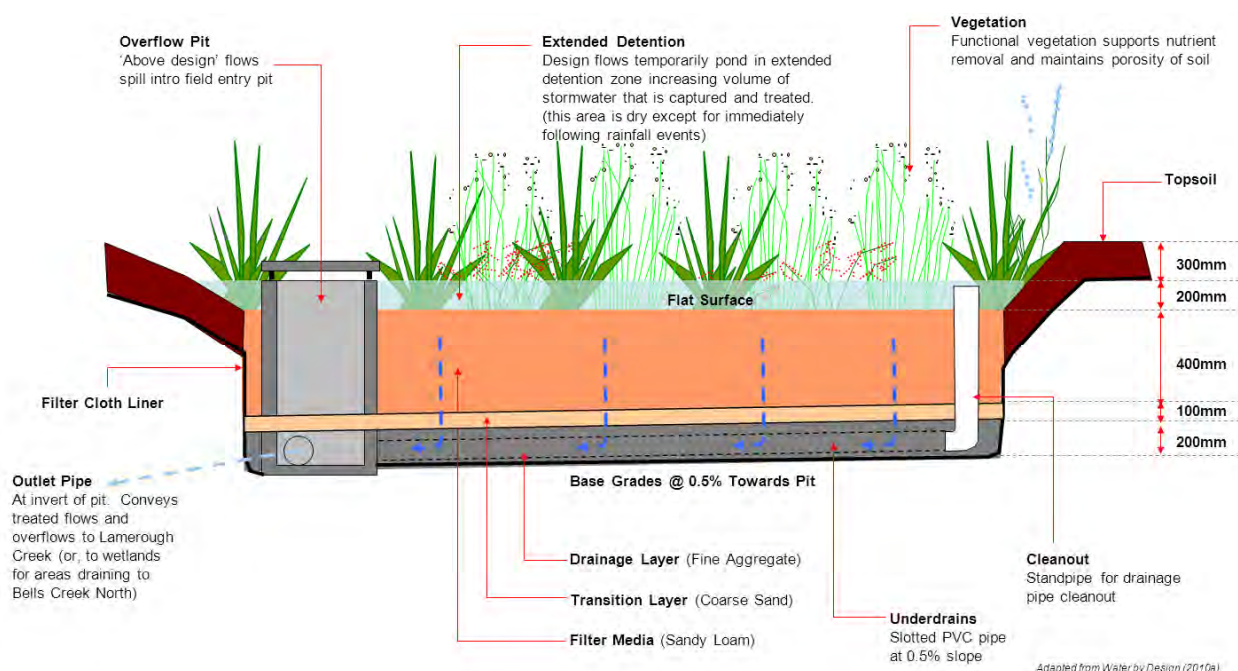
Conceptual Cross Section of Rain Garden Properties
